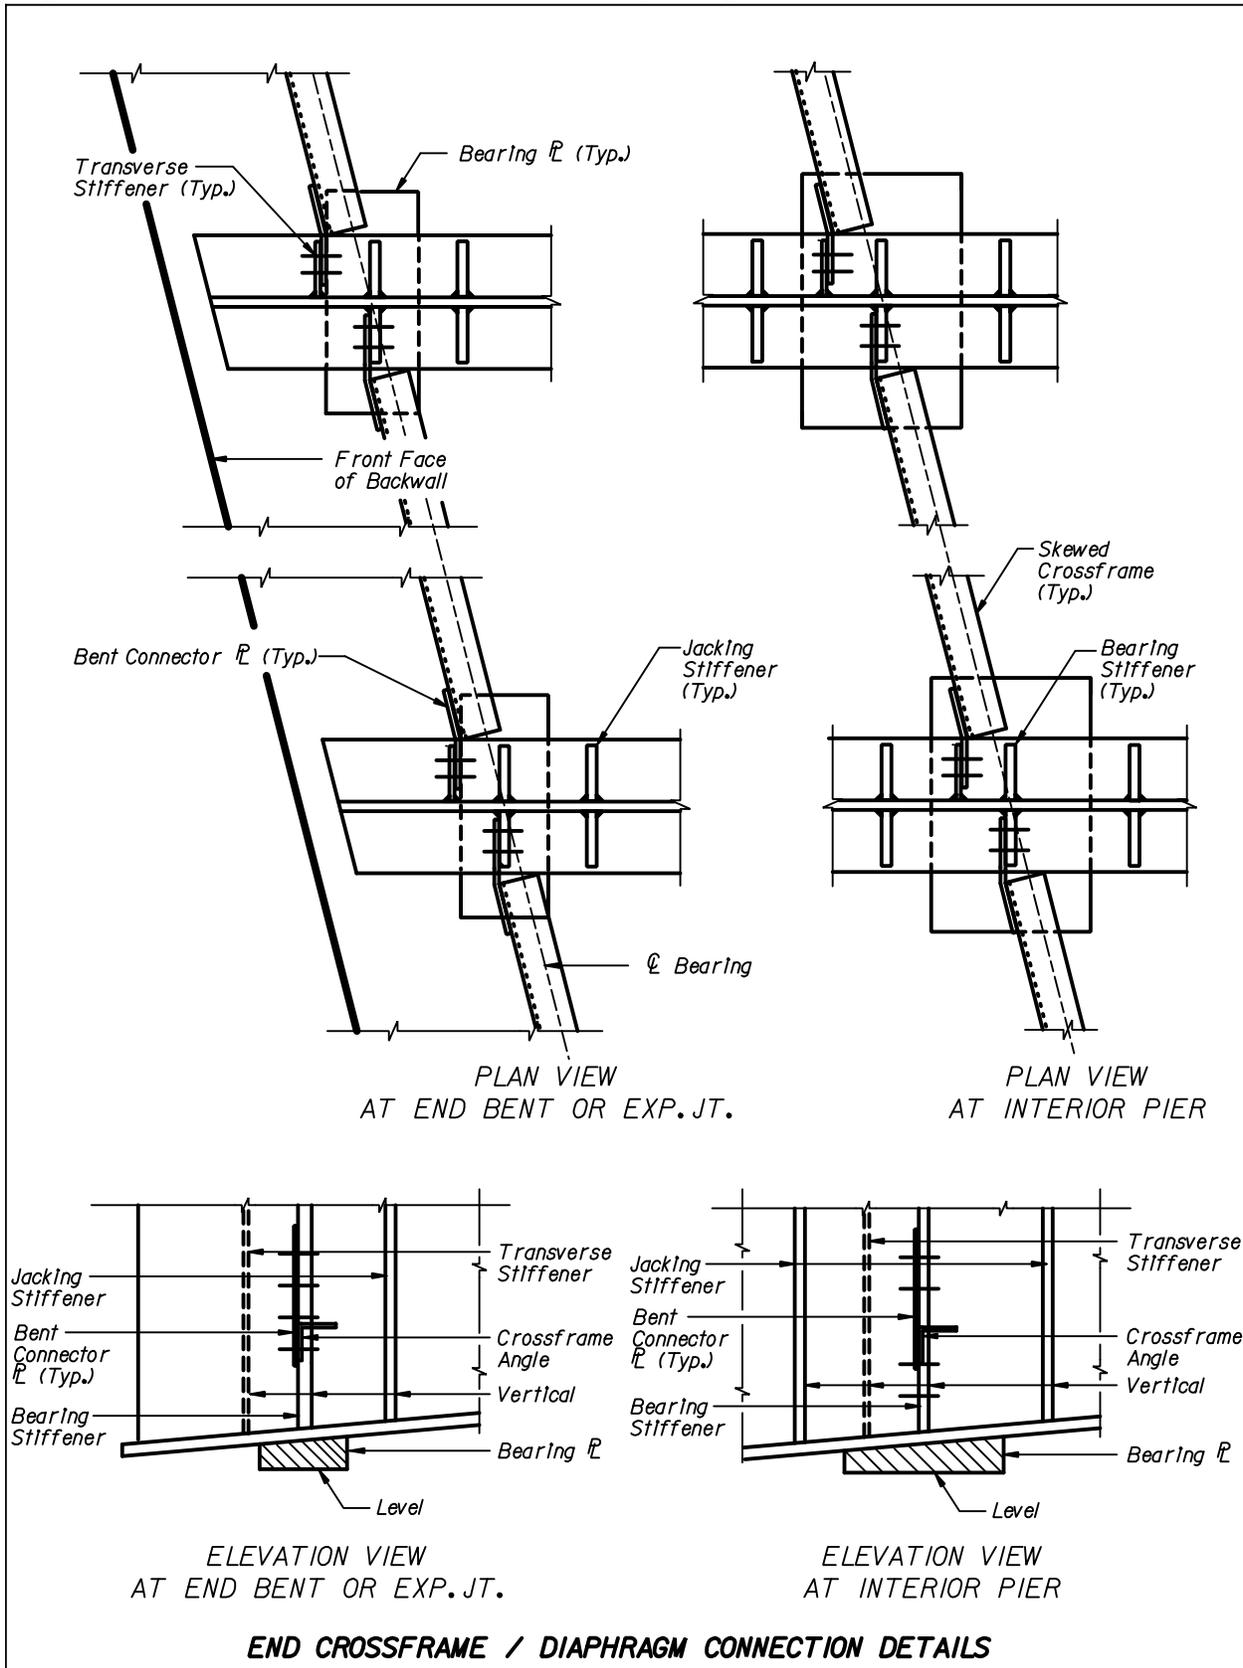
End Crossframe / Diaphragm Connection Details
